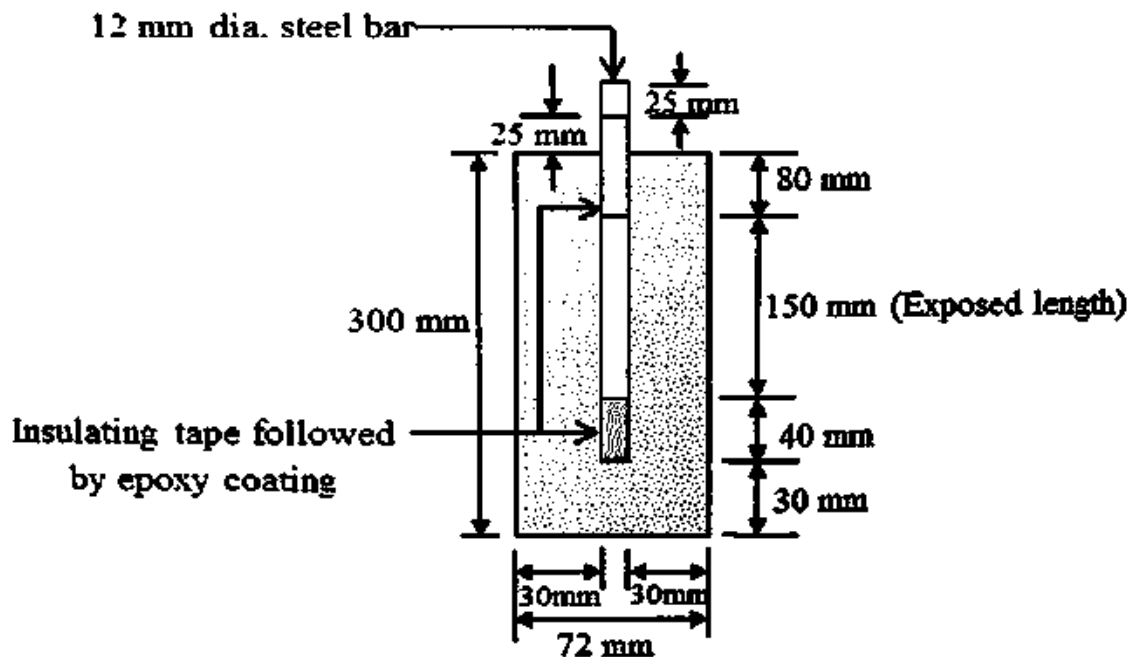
Schematic diagram of prismatic reinforced concrete specimen
